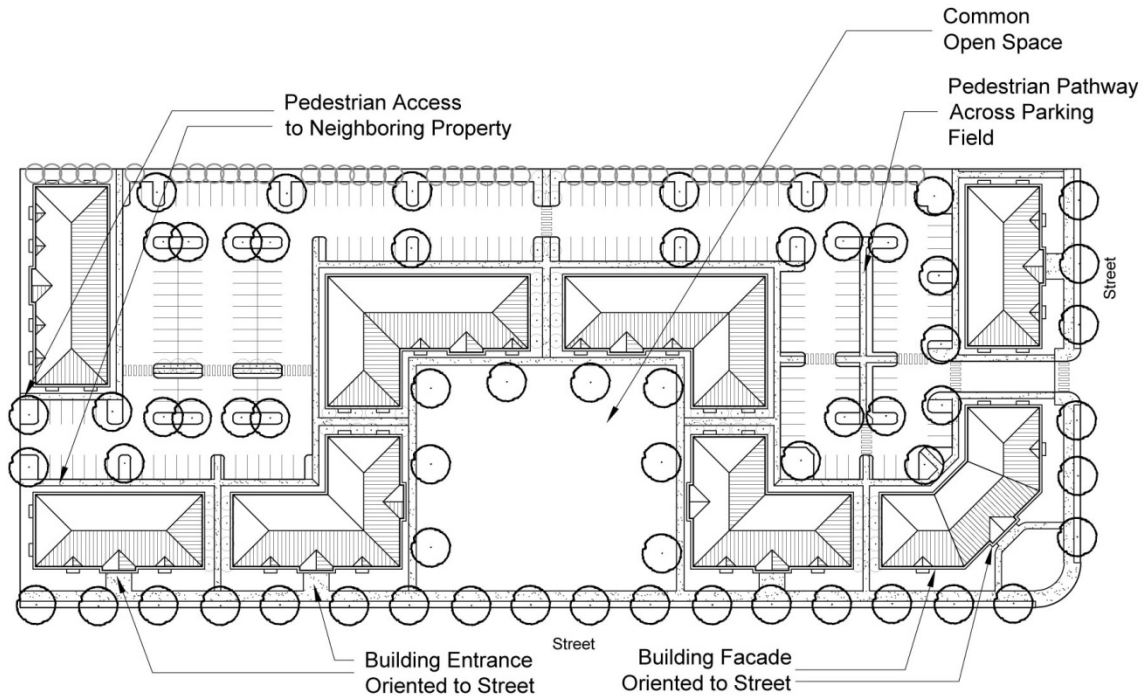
(e).4 – Site Layout – Pedestrian Standards
